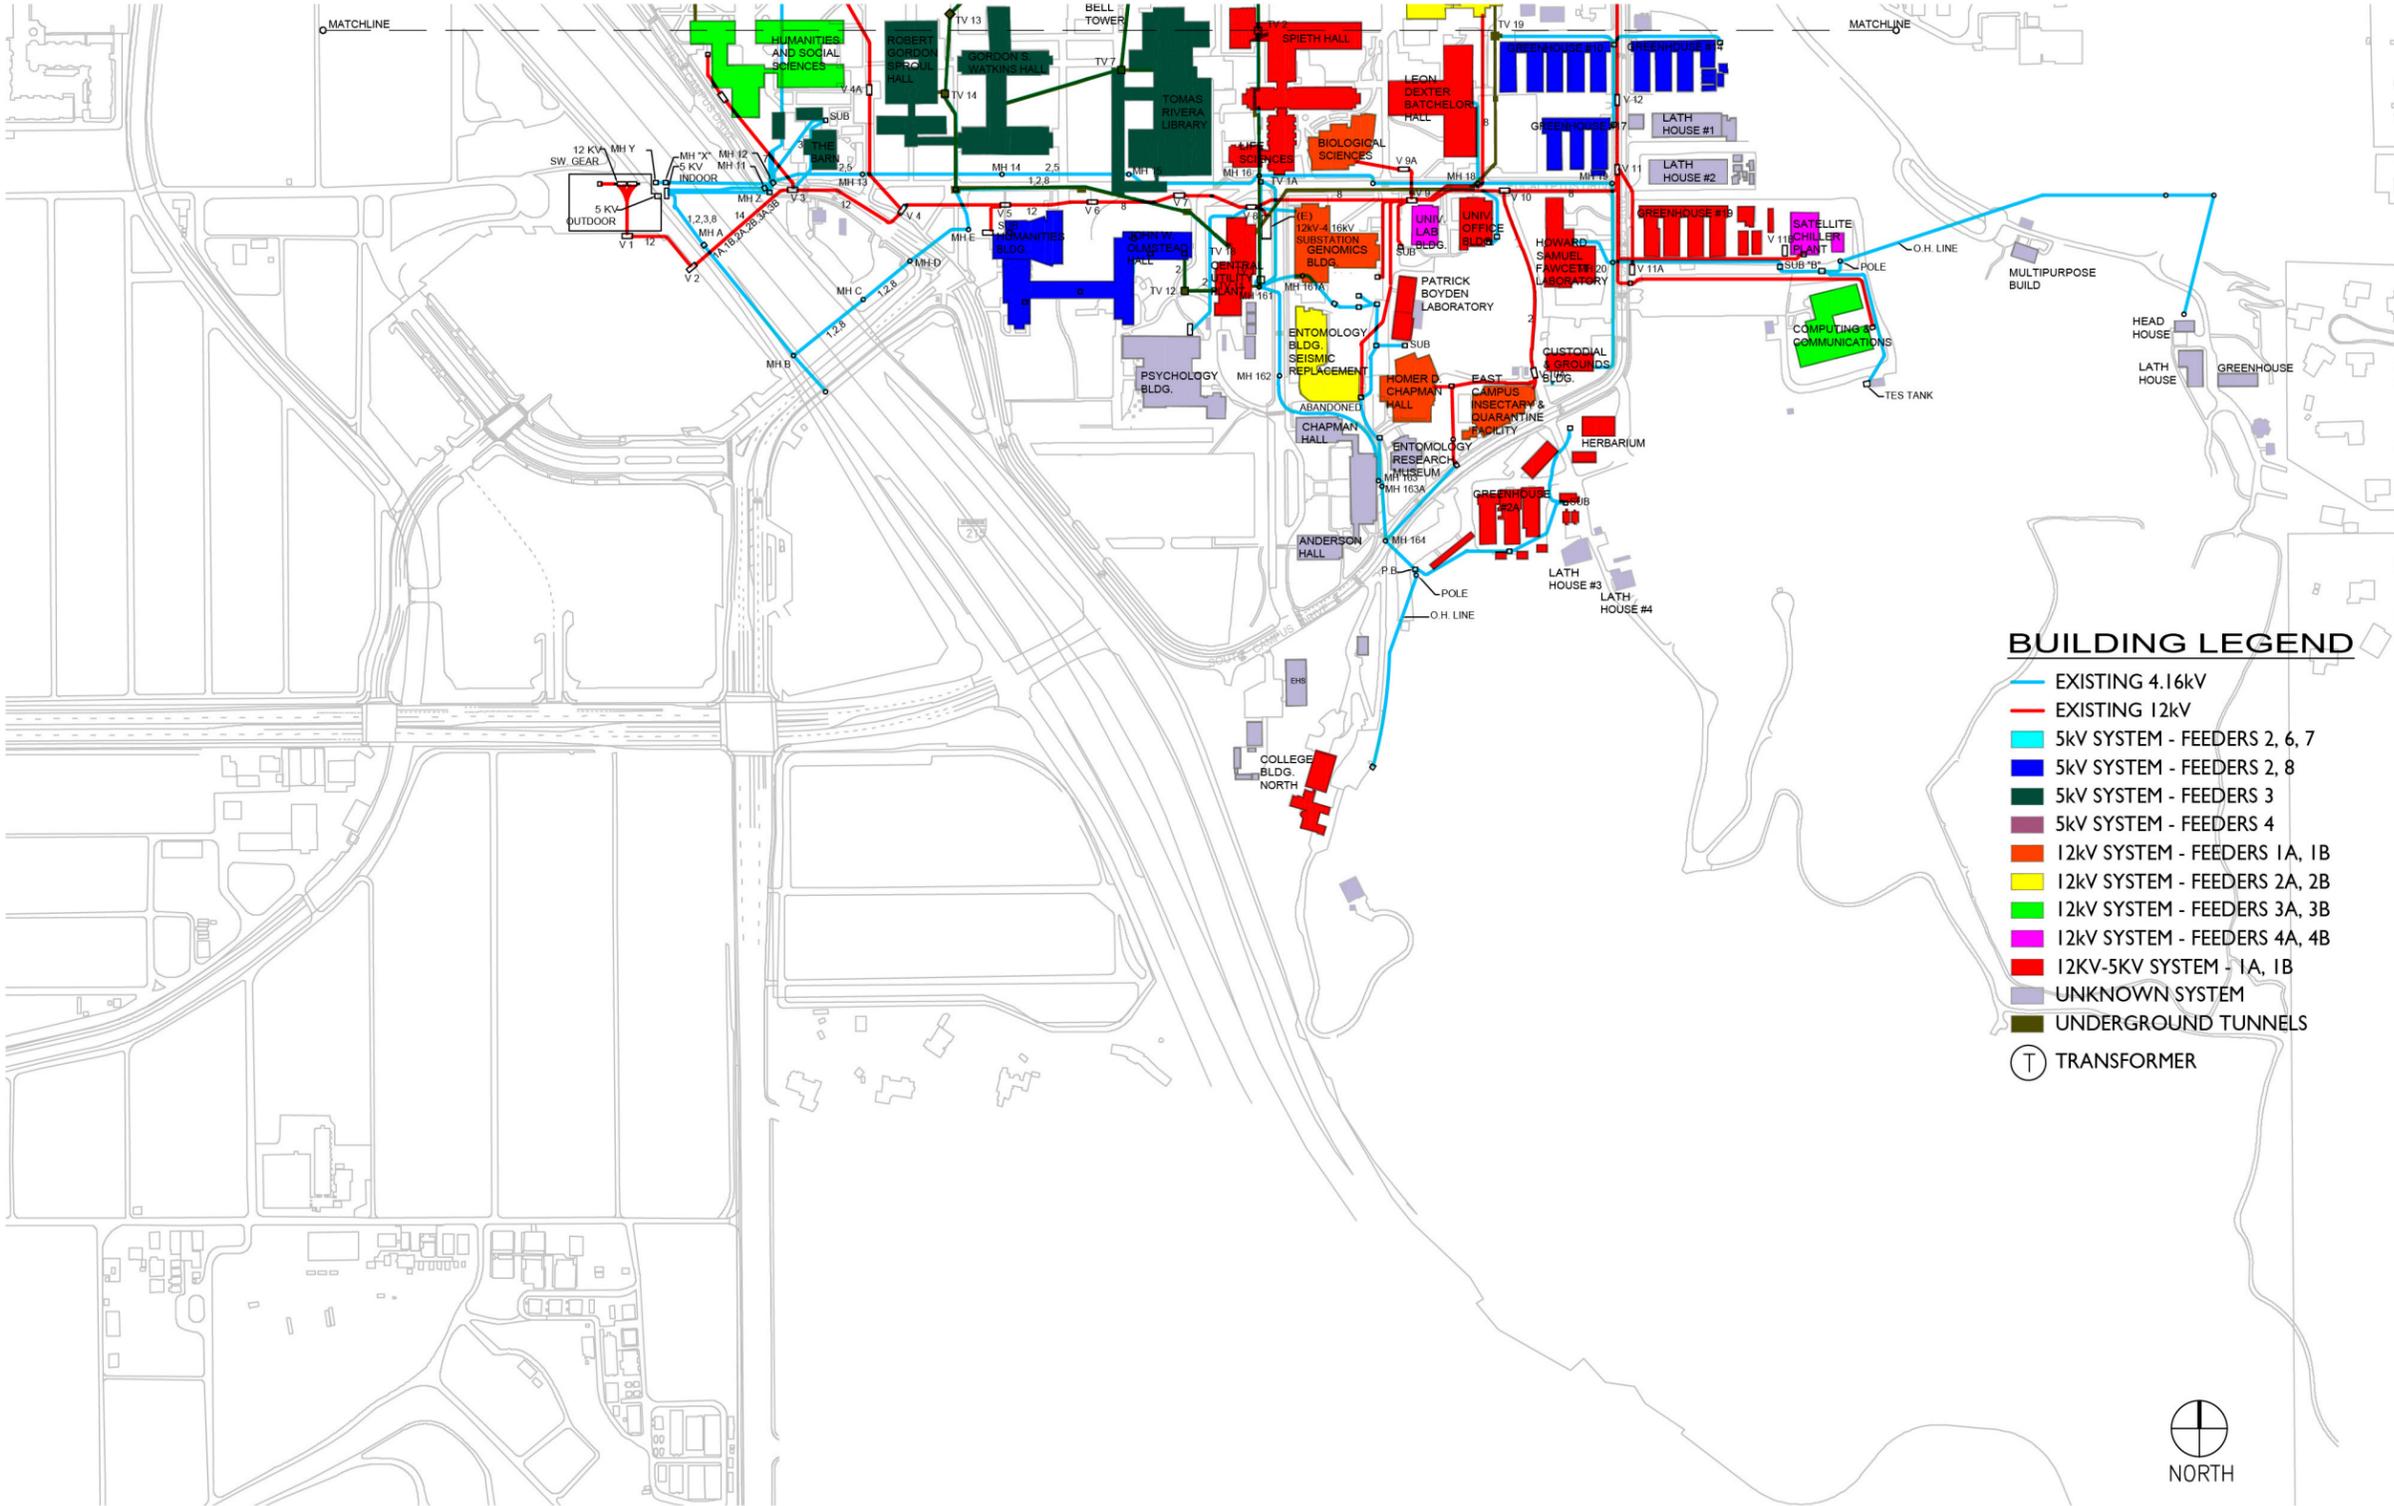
Existing 4.16kV and 12kV Electrical Site Plan by System and Feeders—South
